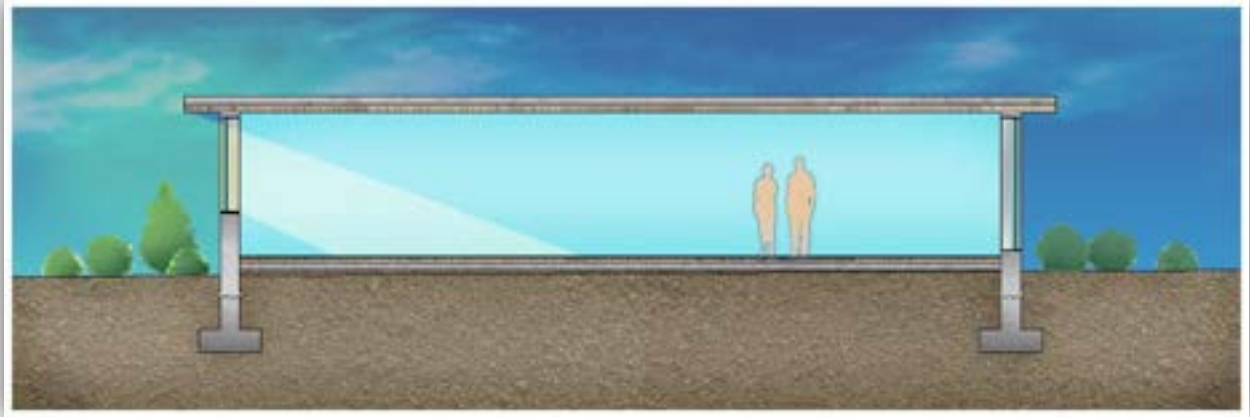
section view at 3:00 PM (15:00) during an Equinox (March or September) with raised windows and two-foot roof overhang. Raised windows that lay a minimum of two feet above the floor still provide excellent views to the outside while reducing internal sunlight exposure near the bottom of the window. Source: primary.
